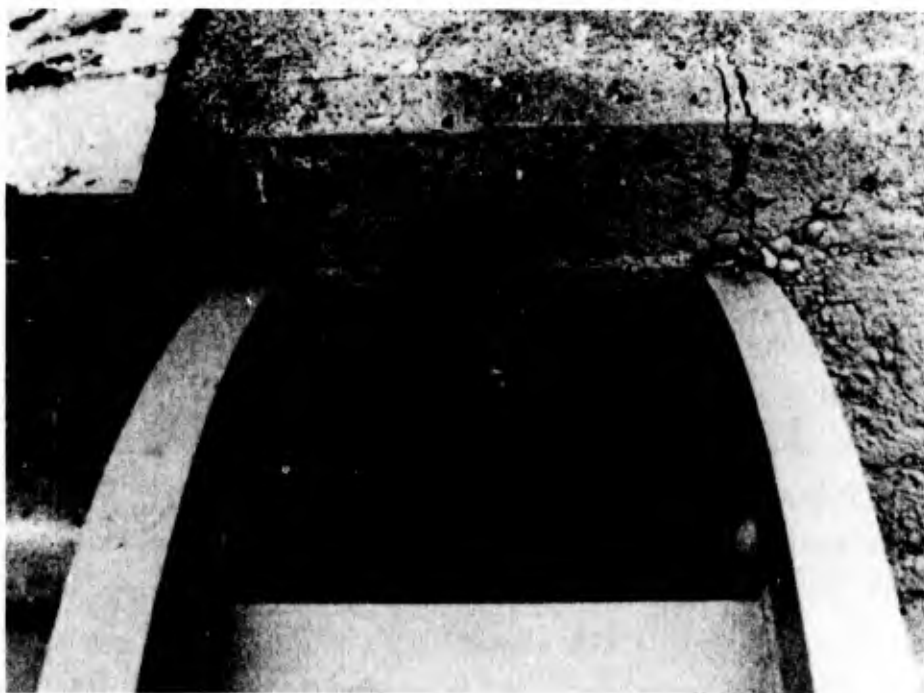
Looking upstream at trunnion shaft area. Typical crack pattern where anchorage head plates extend from concrete, Lock and Dam No. 24, Mississippi River
